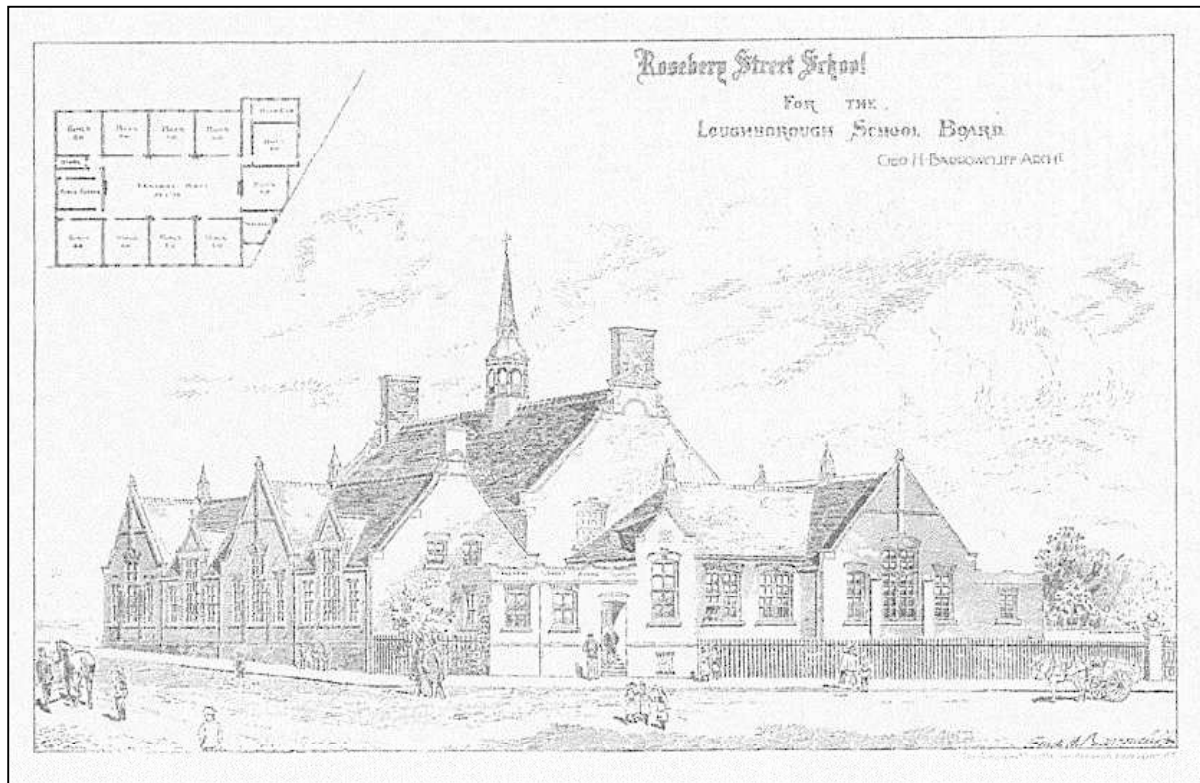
Original architects drawings of the Junior School. These show the layout of the Junior School and the main elevation to Rosebery Street and the alternating gable range to Storer Road. The cut-away corner at the junction of Rosebery Street with Storer Street, shown with a tree, has now been infilled by a flat roofed extension.³
